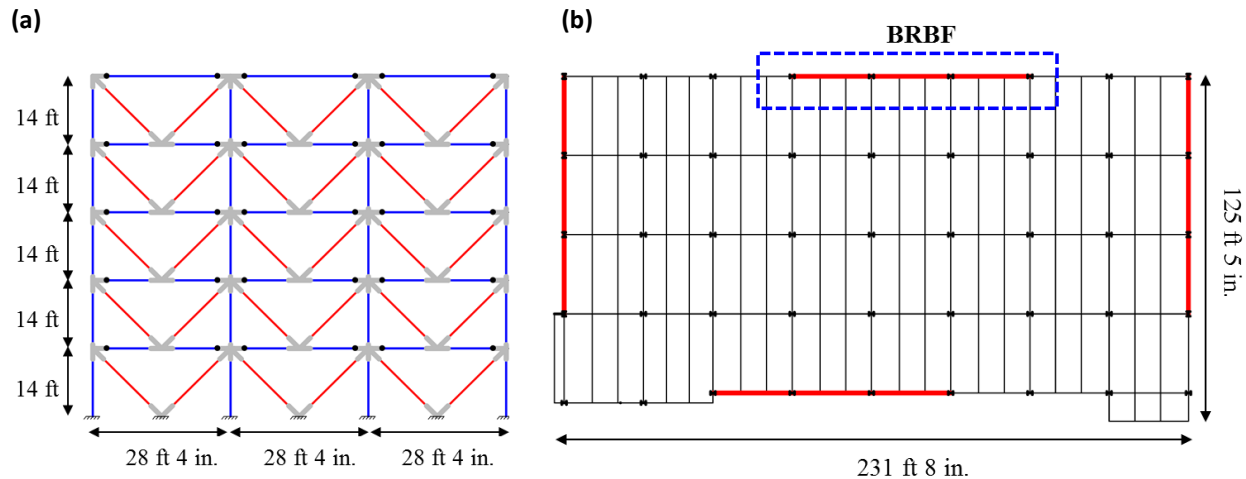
Elevation and Plan View of BRBF Model with V Brace Configuration
